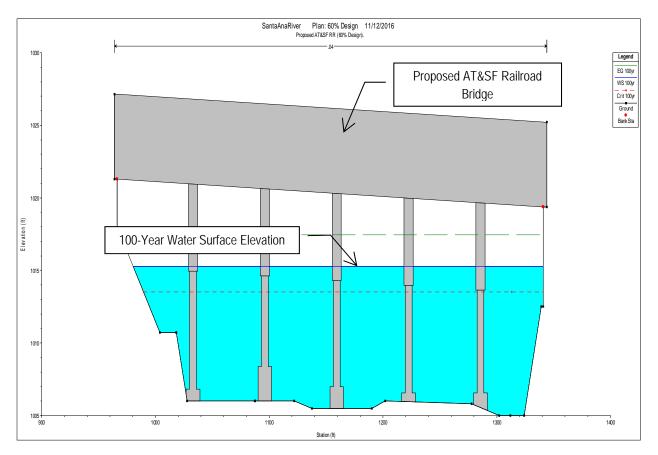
Cross-Section of Proposed Conditions Upstream Face of Bridge 3.4
